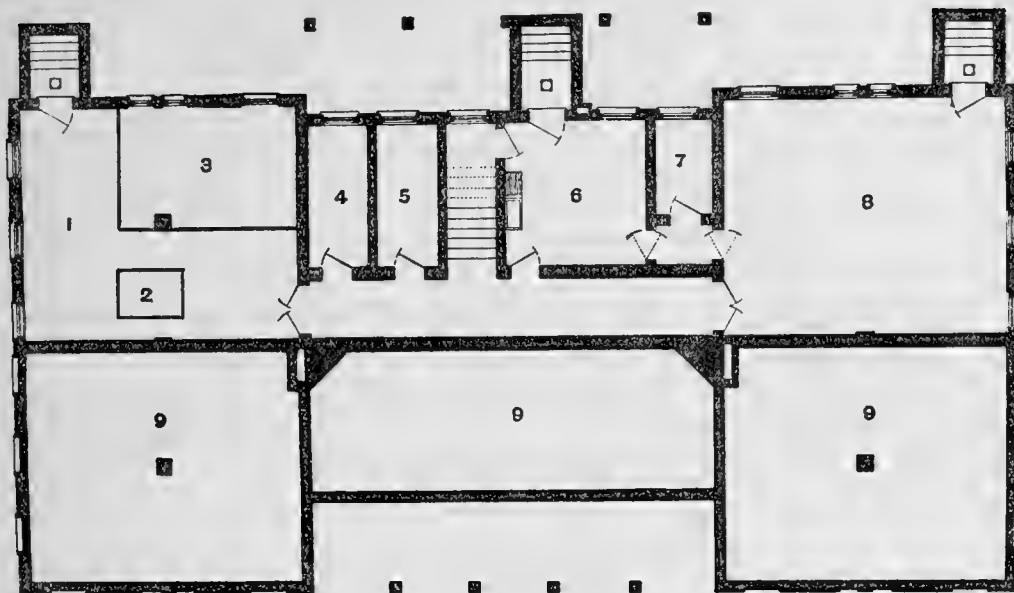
Plan of basement of laboratory. 1, Furnace room; 2, steam boiler; 3, coal bin; 4, store room; 5, toilet; 6, kitchen; 7, pantry; 8, dining room; 9, not excavated.
